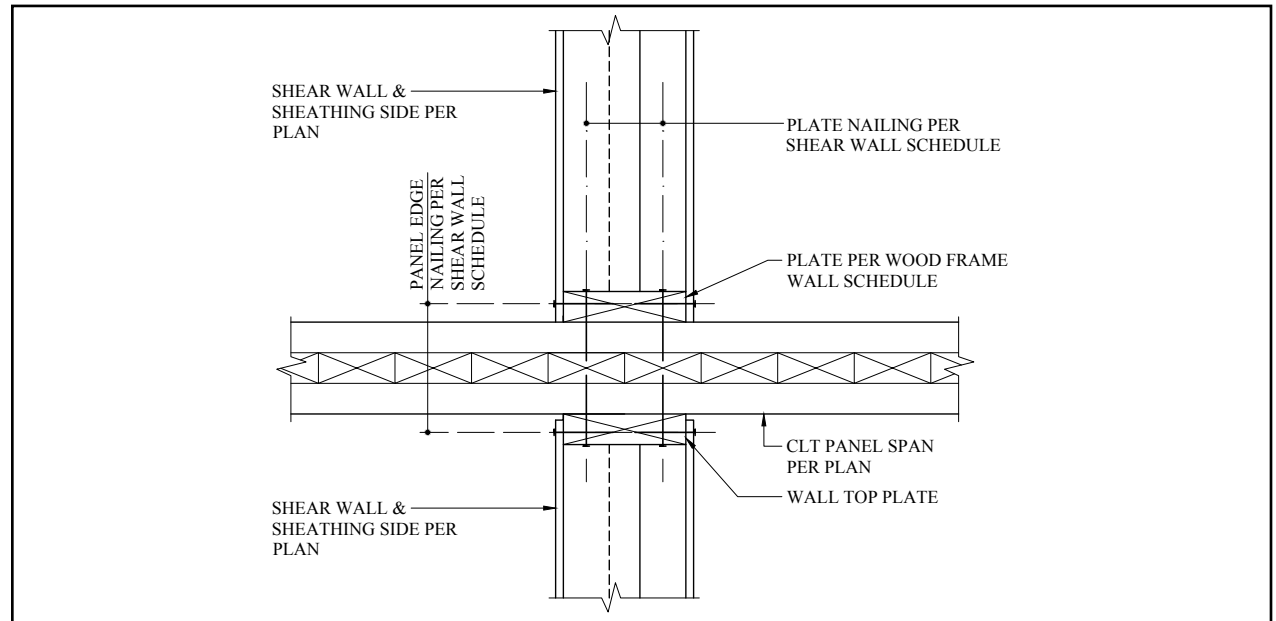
Detail showing continuous CLT floor panel at interior load-bearing wall
